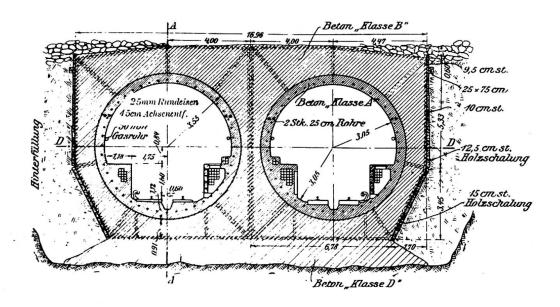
Cross section: Michigan Central Railroad tunnel in Detroit
